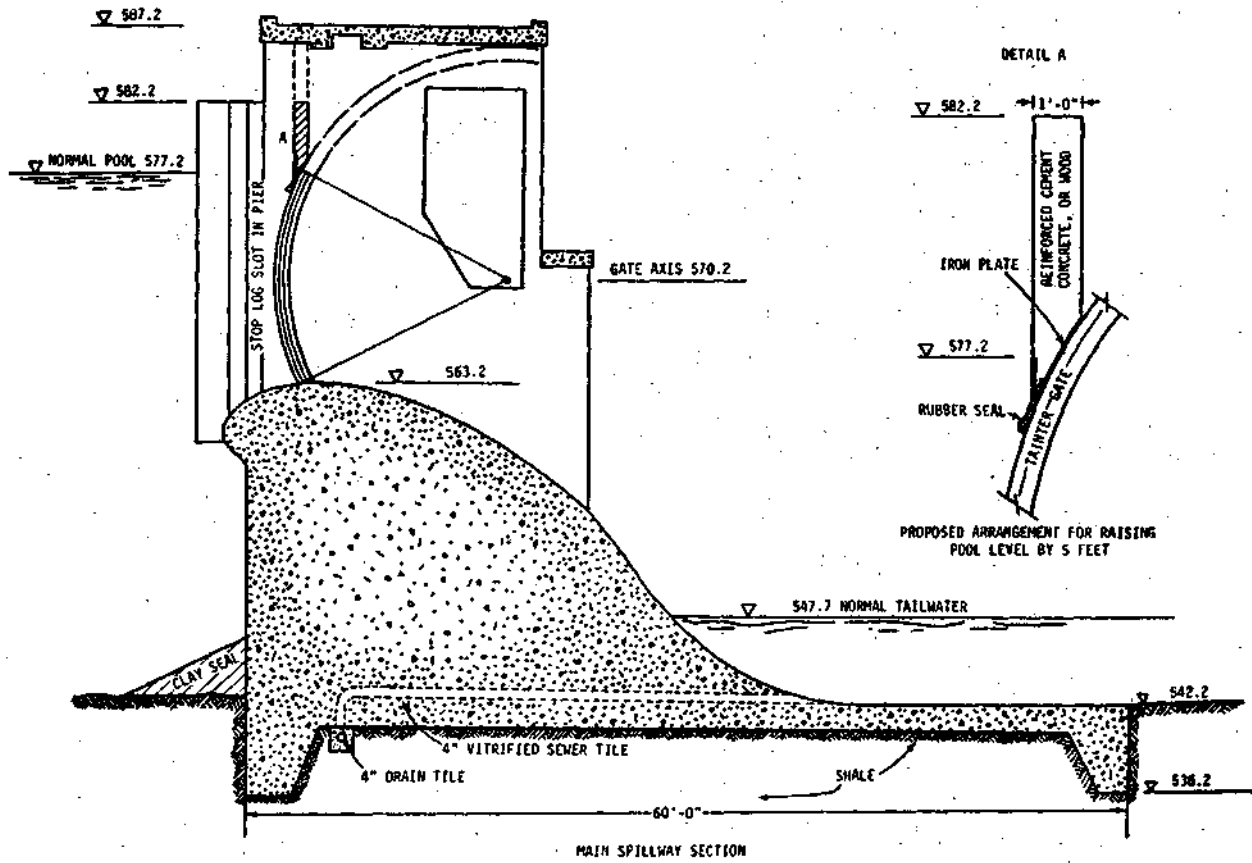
Lake Vermilion Dam cross section and arrangement for raising lake level
